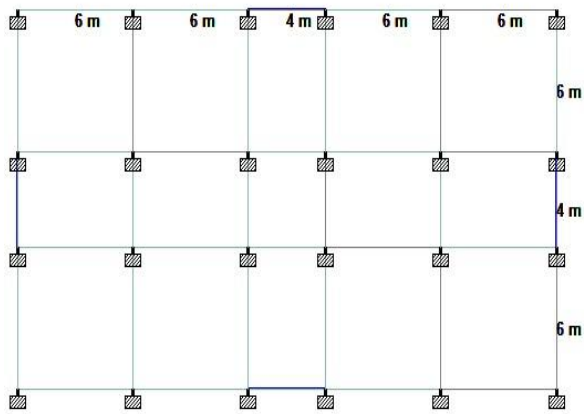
Plan of building frame having Aspect Ratio 1.0 with shear wall (Case Study III)
